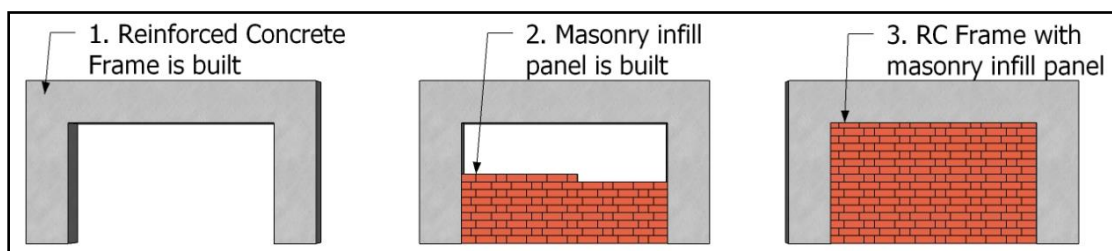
Reinforced concrete frame masonry infill construction sequence (Brzev, 2008)
